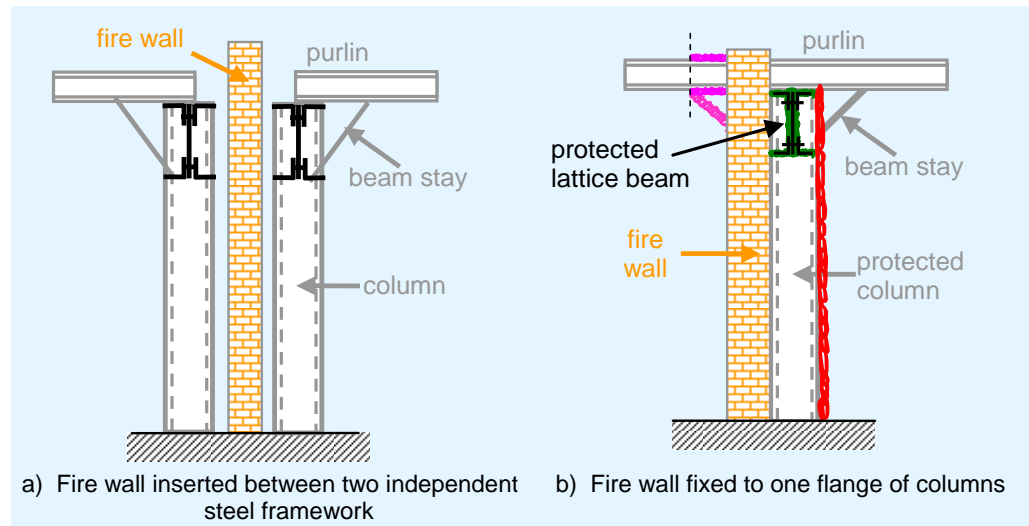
Design detail near fire walls parallel to steel frame with lattice beam
